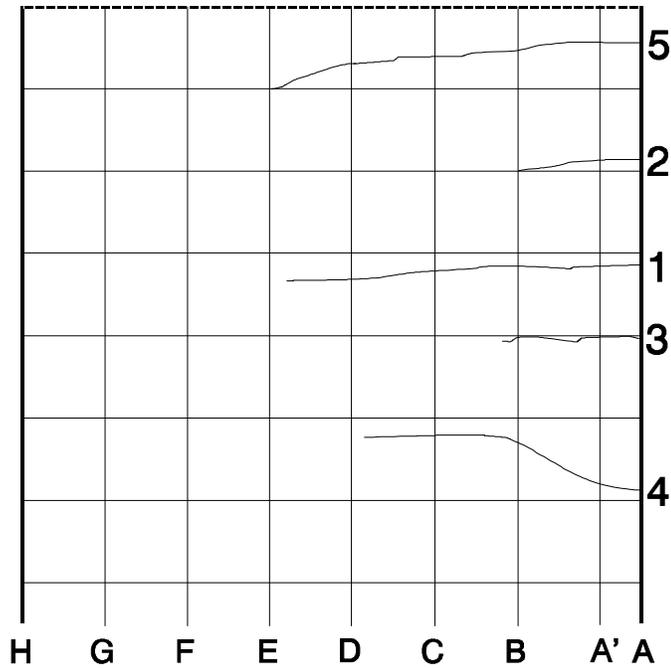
POJ-RC-100-TH cracking pattern on south face of pier at dead load
